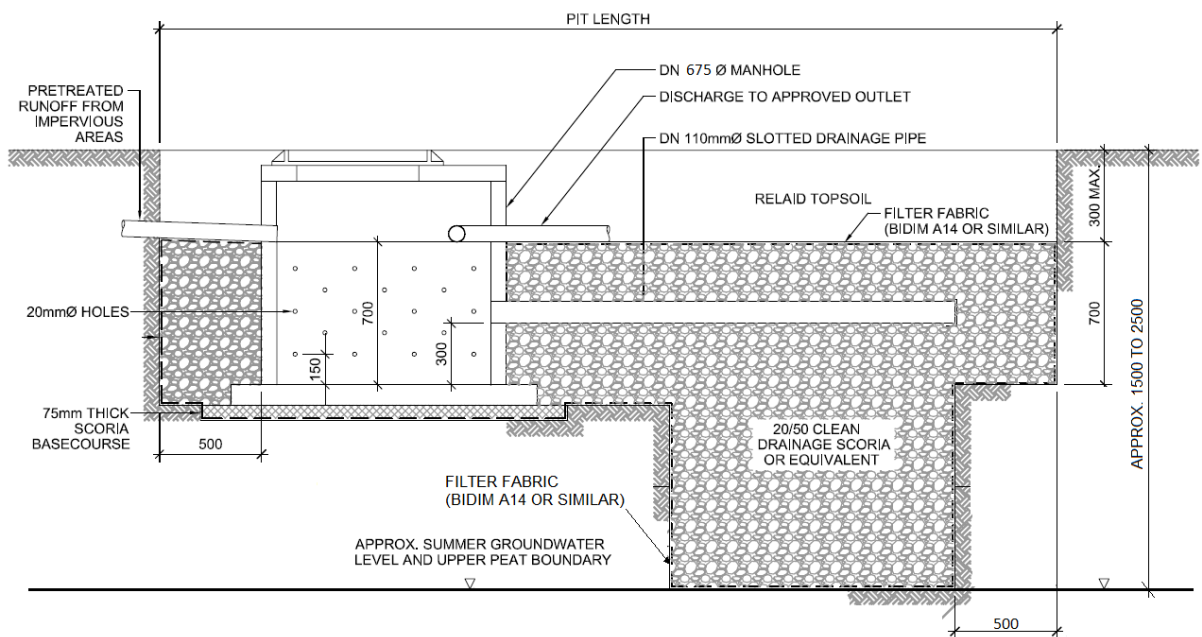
Private groundwater recharge pit (section view) for impervious surface areas (modified SW-21 with 675dia chamber)
